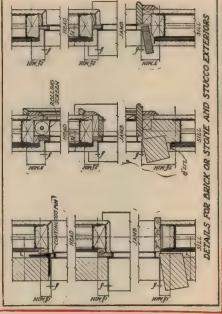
Typical window details for steel sash showing methods of blocking to steel frame.
